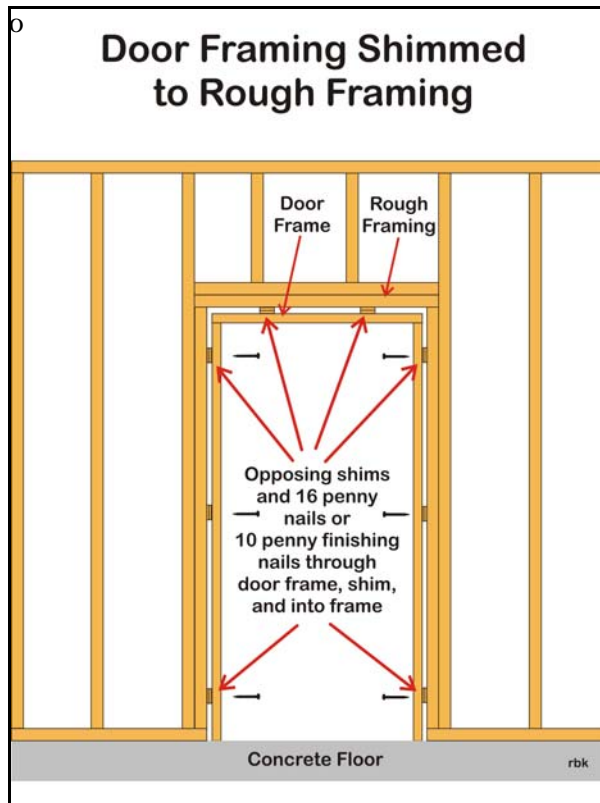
Framing Out the Door – Normally, the door frame is fastened to the rough framing with opposing shim, three sets on each side. Source: author – [file:\SH-DoorConstruction05.cdr].
